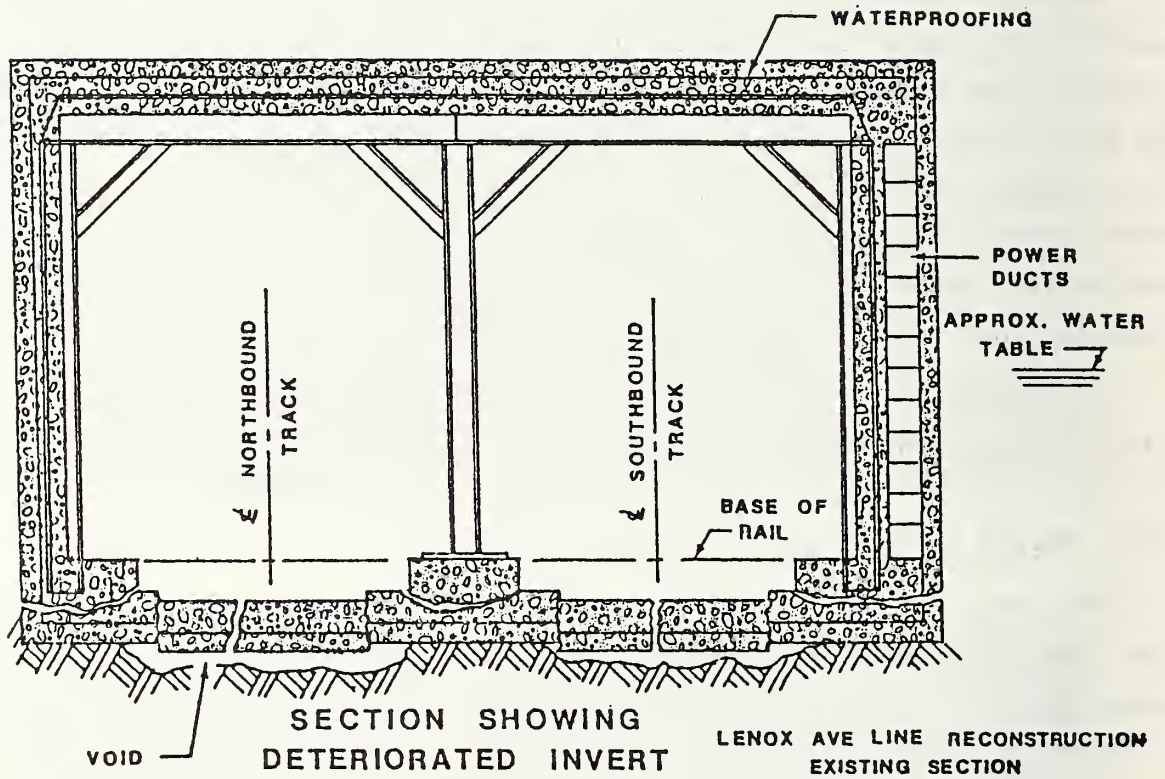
WATER INFLOW BETWEEN THE BLOCKS OF DESTROYED TUNNEL FLOOR
